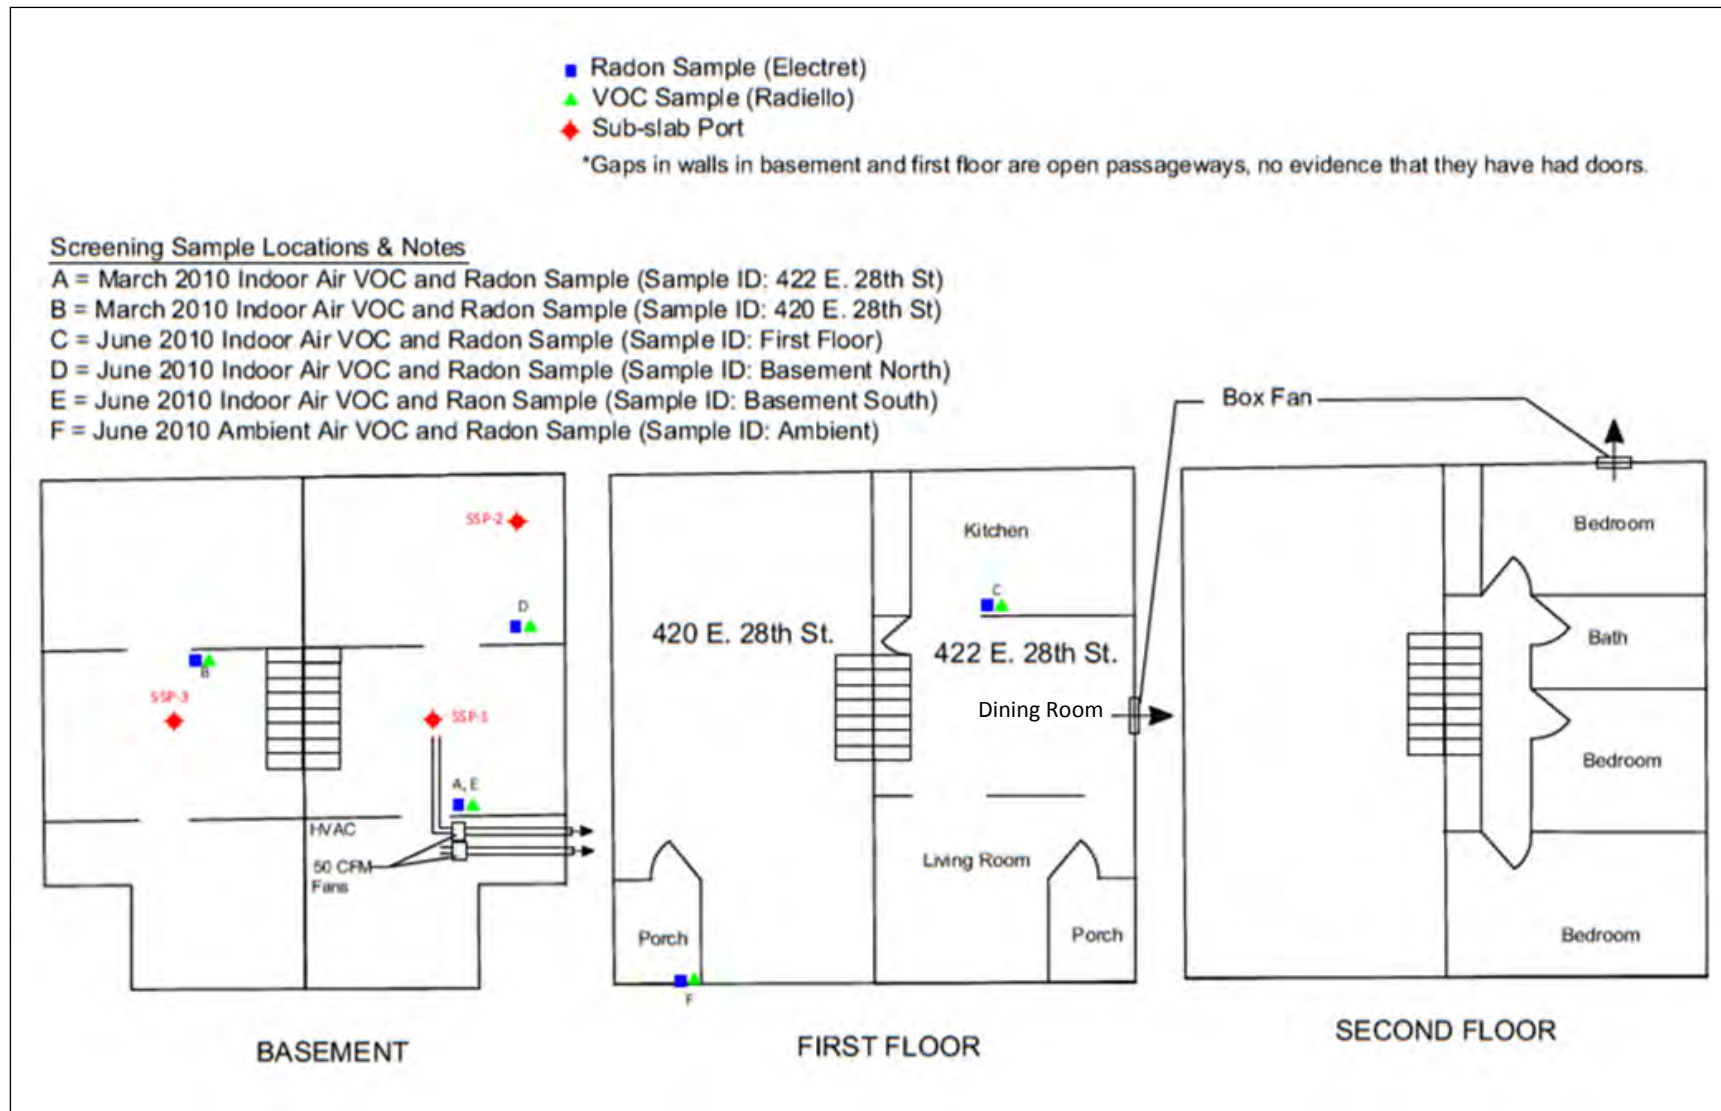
Test building floor plan showing sampling locations used in preliminary screening.
